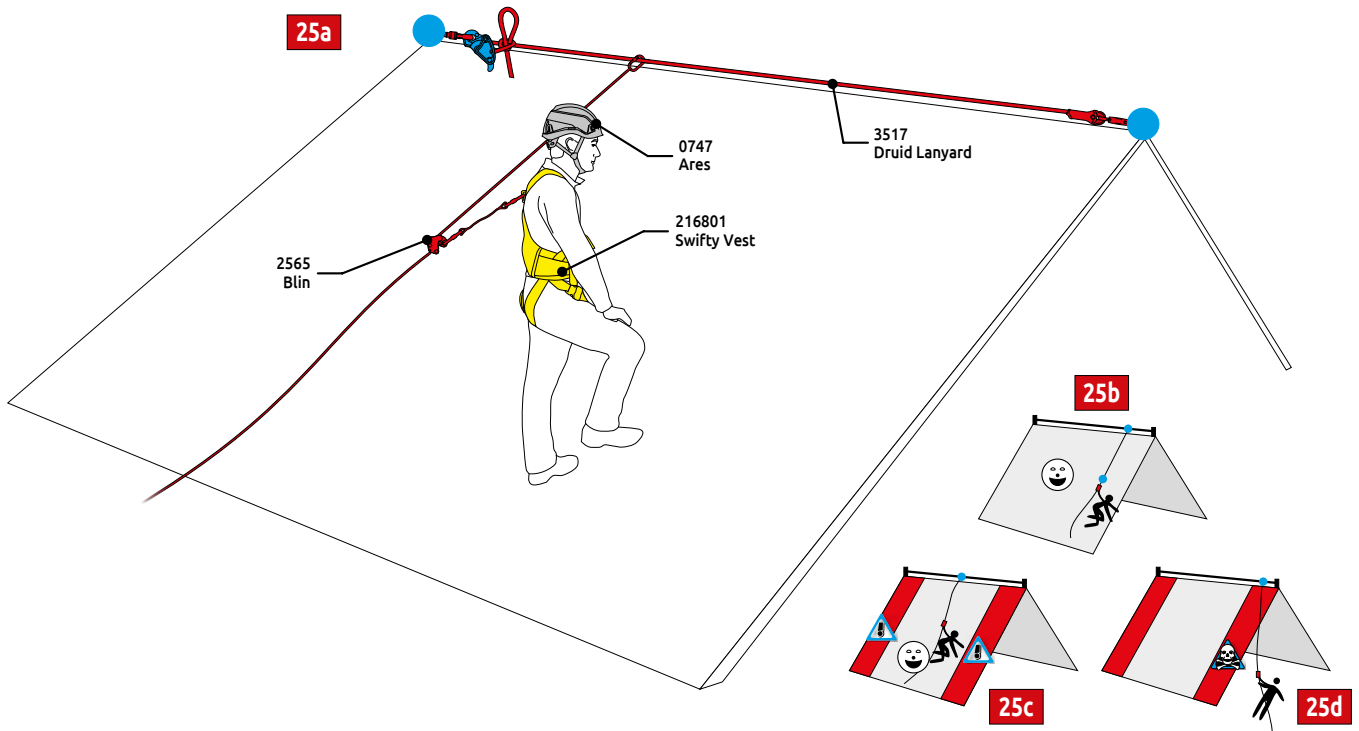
On roofs and terraces, horizontal anchoring lines (which can be permanent or temporary) or individual anchoring points can be used.
